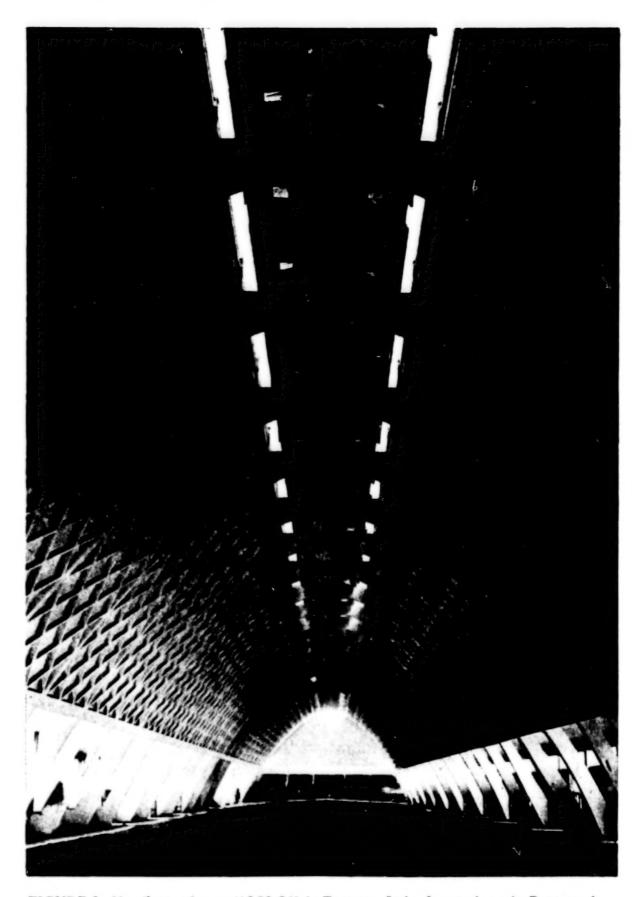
Nervi's warehouse (1950-51) in Tortona, Italy, for storing salt. Patterned ferrocement surface is structurally in collaboration with reinforced-concrete ribs and outer surface. Ferrocement has been used in the construction of domes and roofs over stadiums, opera houses, restaurants, but such applications are less relevant to urgent needs of most developing countries. (Studio Nervi, Rome)
